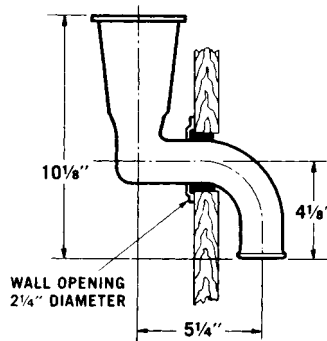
3- by 6-in. Oval Vertical 1 1/2-in. Outlet Wall-Mounted Cup Sink
